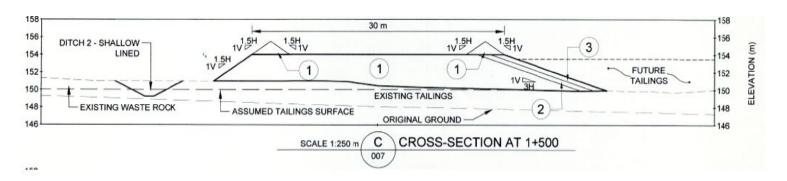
Typical Cross-Section of North Cell Internal Structure
